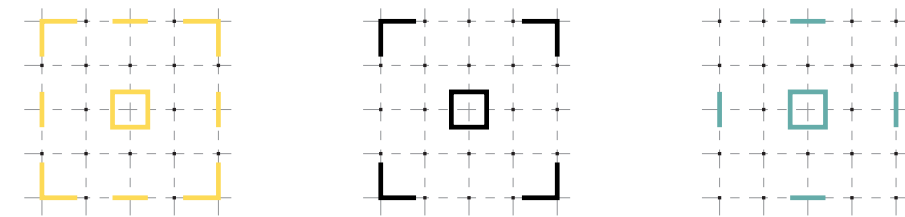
6", 9", and 12" Wall Layouts, 100' Tall Building
